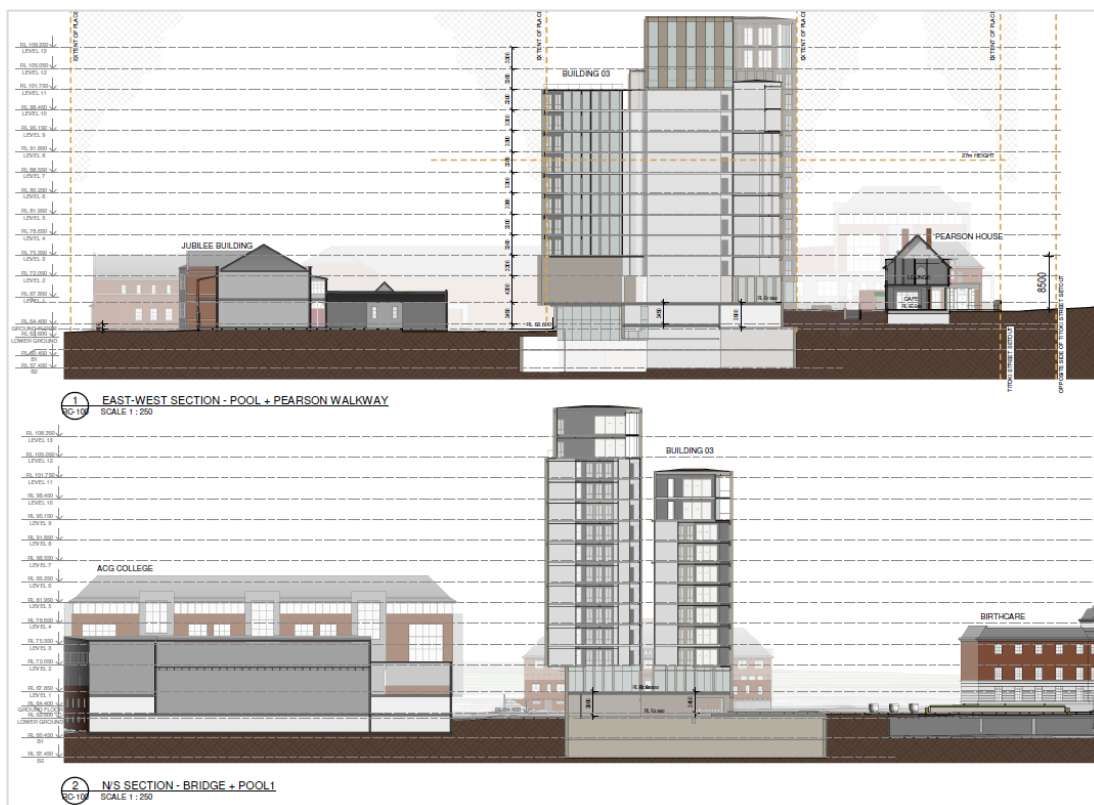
Proposed building and basement in elevation in relation to the scheduled heritage curtilage.
